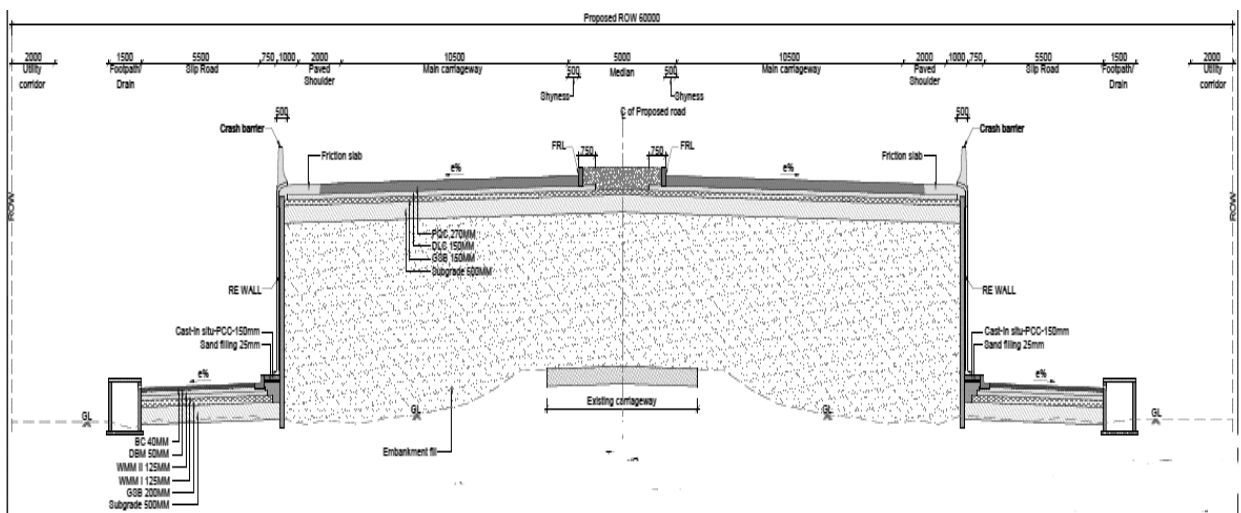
(TCS-6A) 4 Lane Underpass Cross Section With Slip Roads In The Existing Road
